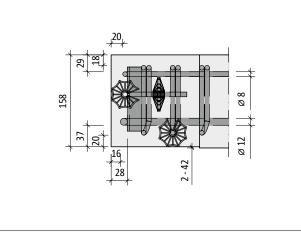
Schöck Tronsole® type Z: Side view of a concrete landing with integrated load-bearing element
